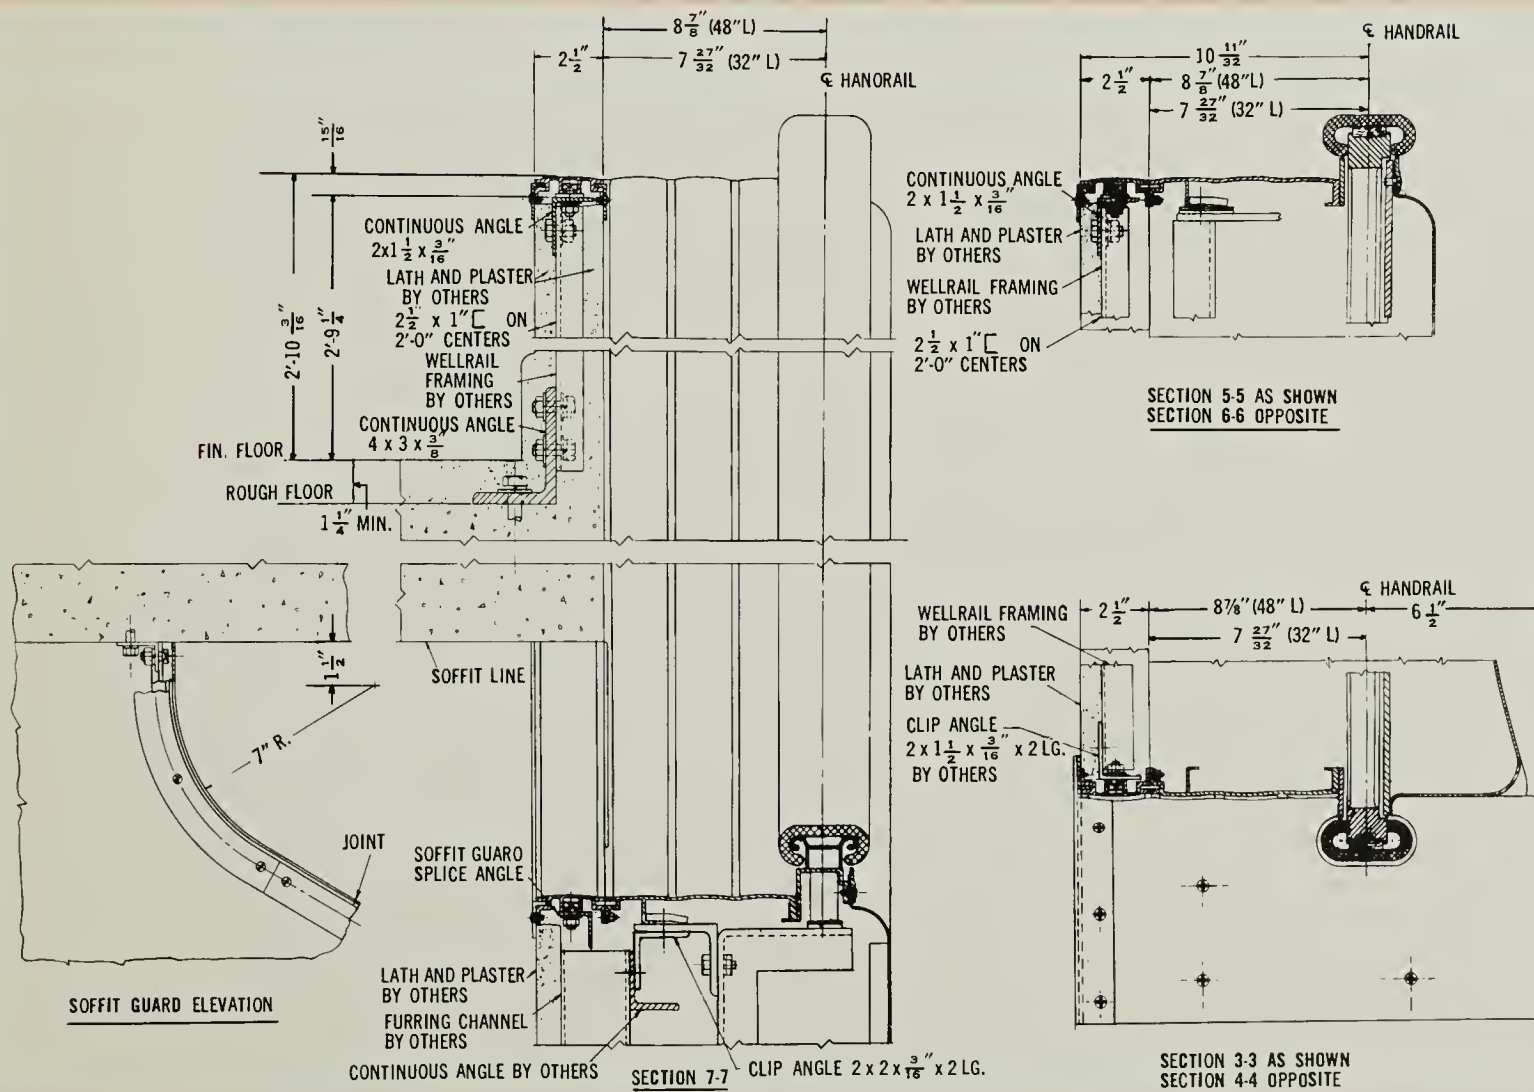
Sections Through Balustrade—Wellway Railing—Plaster Exterior
